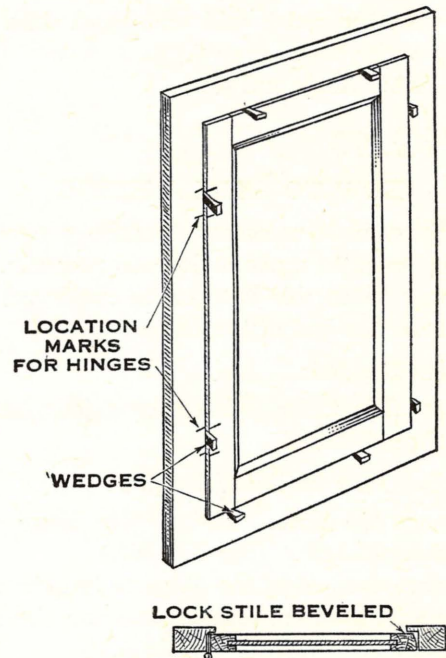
A small door is fitted in the opening with the lock stile slightly beveled to allow for the swing
